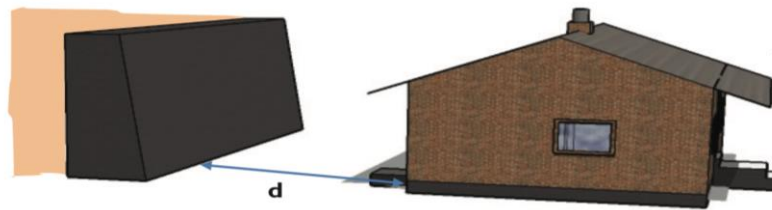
Relationship between height of the retaining wall and the distance between retaining wall [61]
